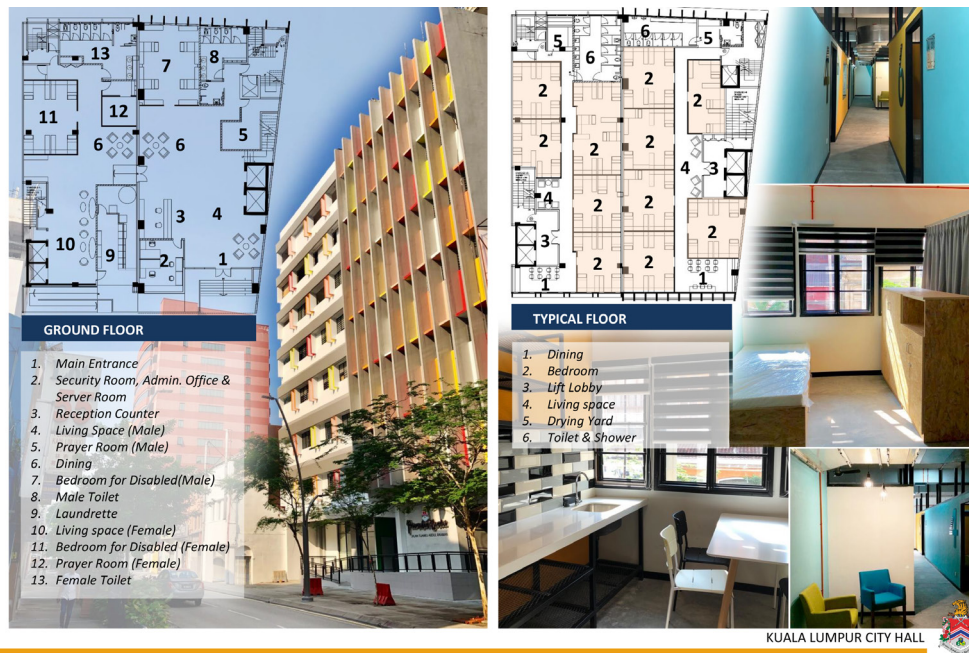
Floor plans of the converted Perumahan Bandar @TAR. DBKL
